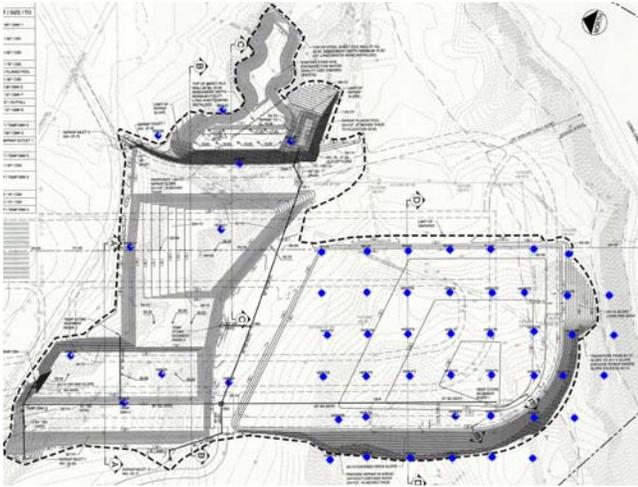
Site Grading and Subsurface Exploration Location Plan
